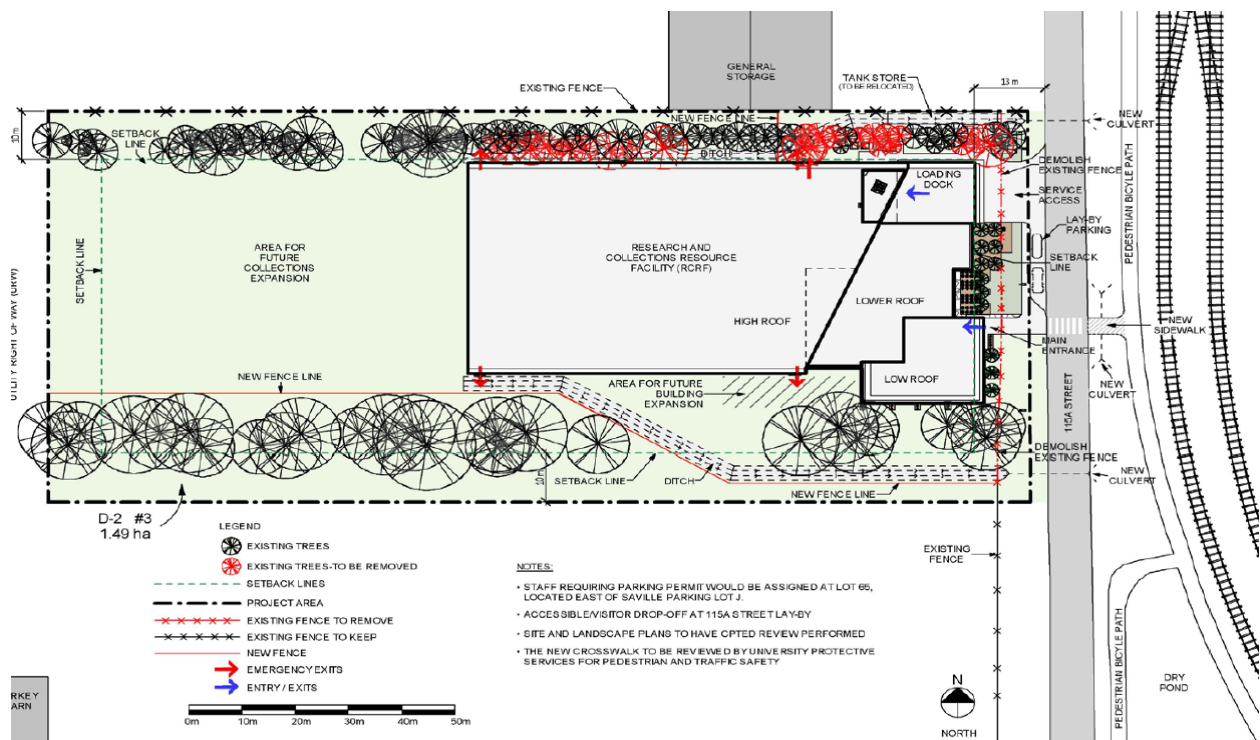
Site layout plan. University of Alberta. RCRF Design Development Report submission – January 11, 2016. Stuart Olson/HFKS Architects, Inc.
